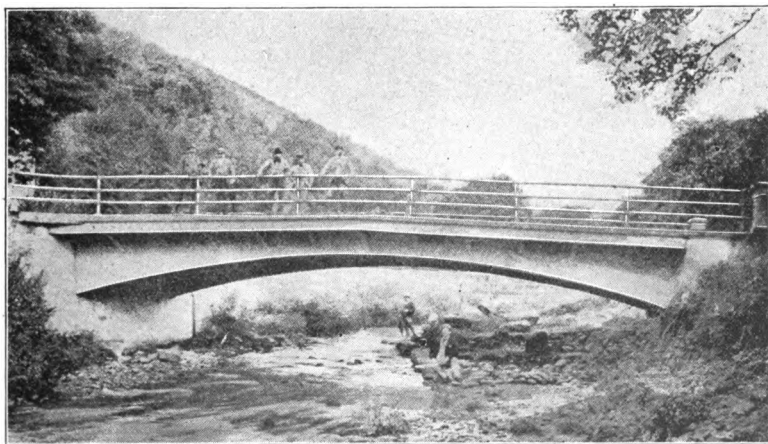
Reinforced Arched Highway Bridge of 50 ft. span.
